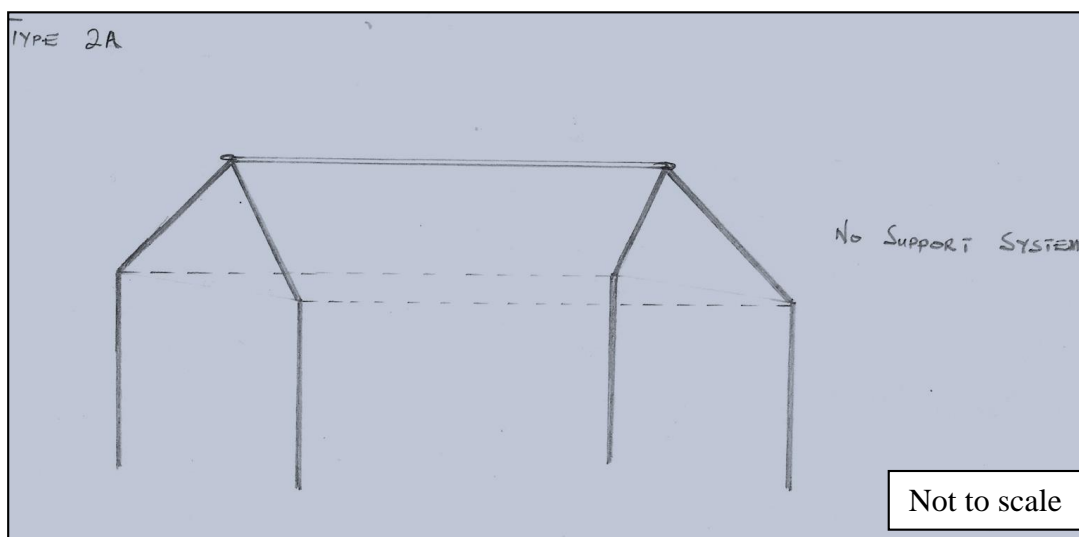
Type 2A- Triangular truss roofing style (by Author and M. Amenyo-Xa)
